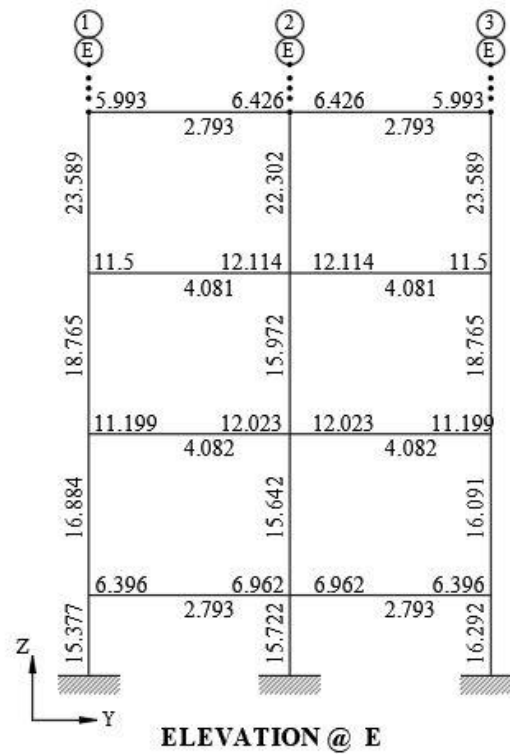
Reinforcement details for 4 storey building for grid -E
